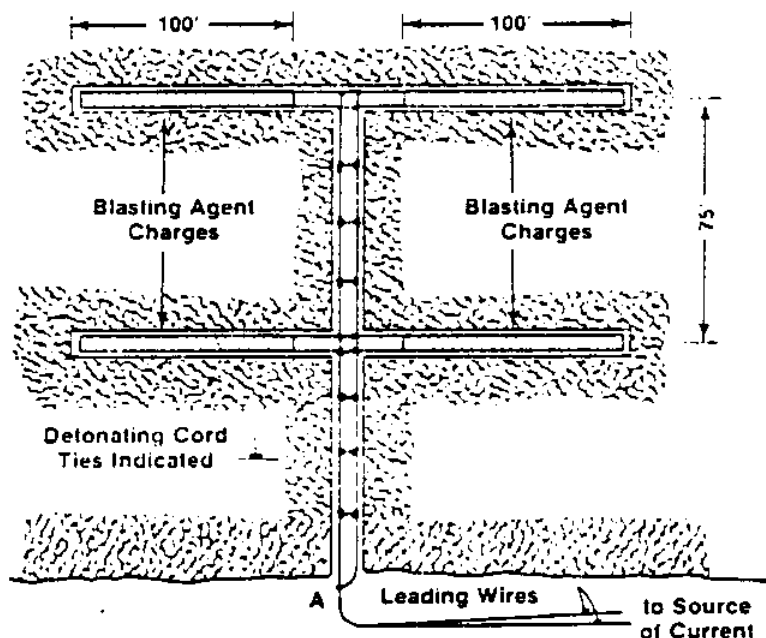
This typical Coyote tunnel plan consists of an adit with either one or two cross-wings. Distance from portal and between cross-wings varies with the terrain.
